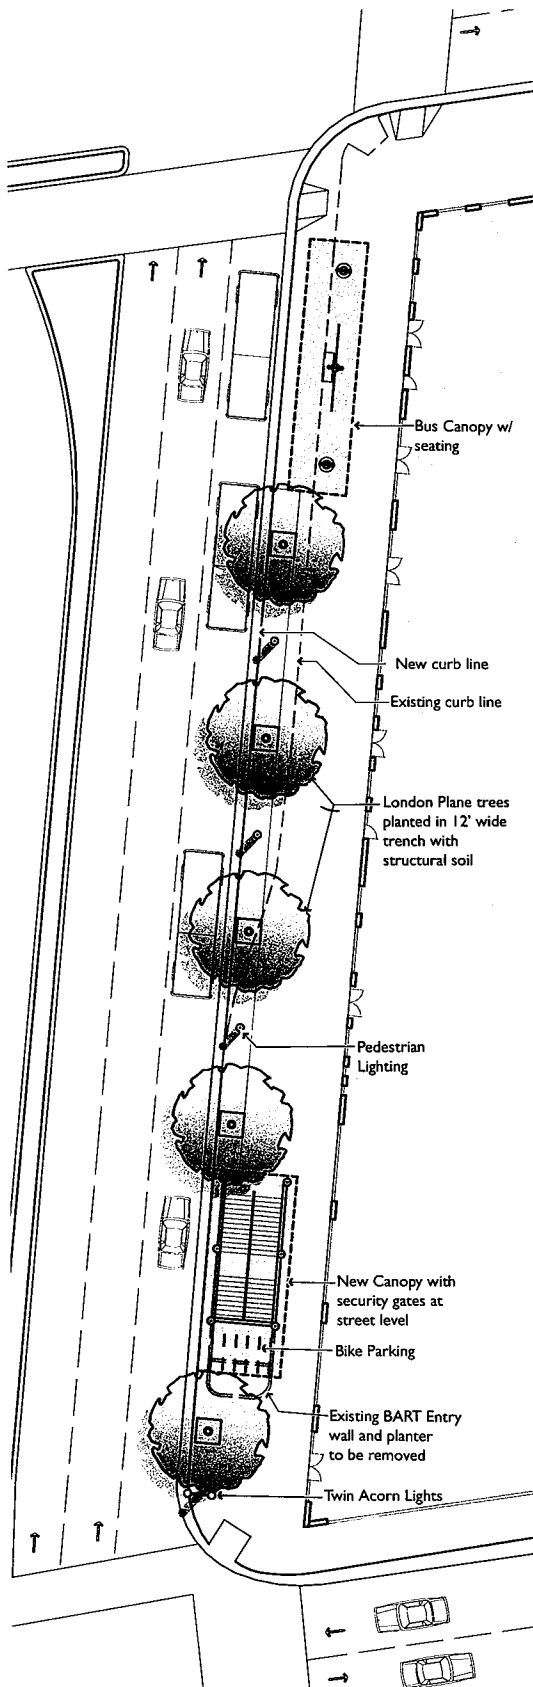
Potential reconfiguration of the curb on east Shattuck Avenue allows for a widened sidewalk with improved bus loading area.
